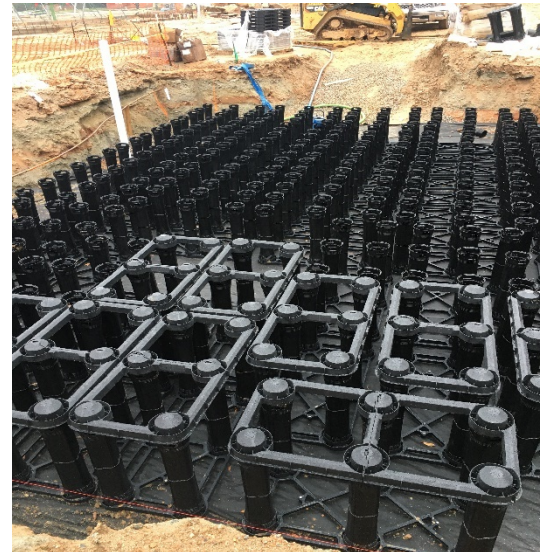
Construction of Stormwater Control Silva Cells in Chavis Park
